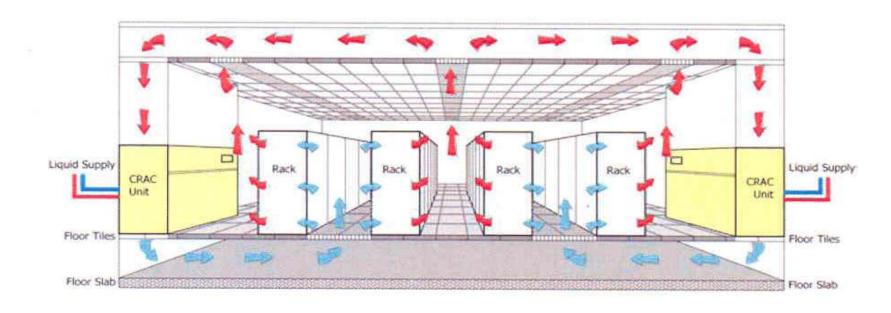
Raised floor implementation using a dropped ceiling as a hot air return plenum.
